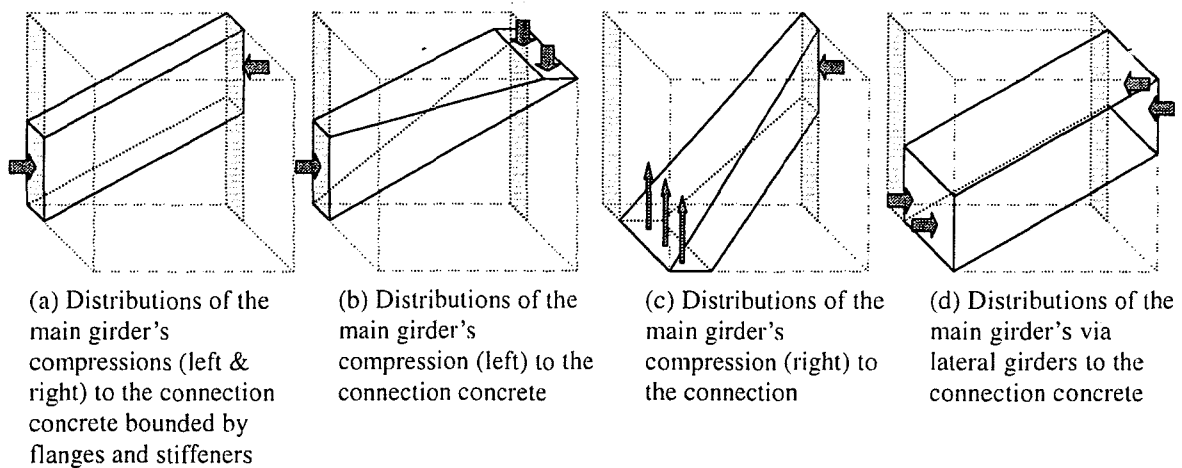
(b) Force transfer mechanisms inside connection concrete of specimen C-2.
